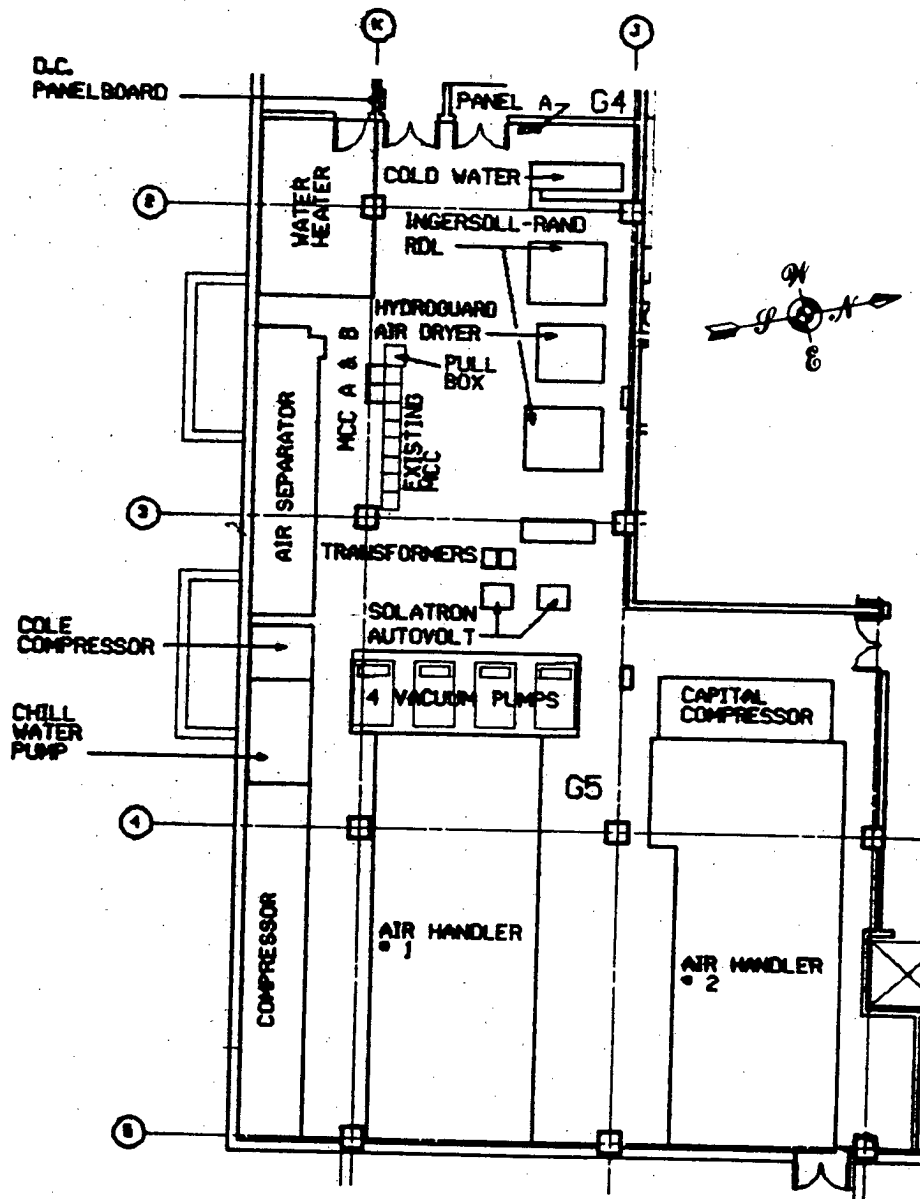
MECHANICAL EQUIPMENT ROOM G5 LAYOUT
